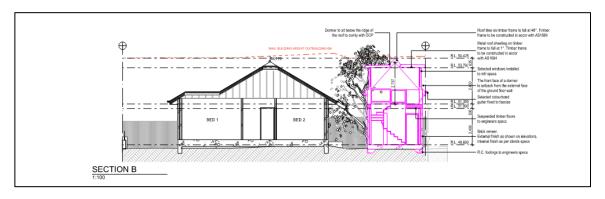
Proposed section plans (Source: Gardner Design & Drafting).
